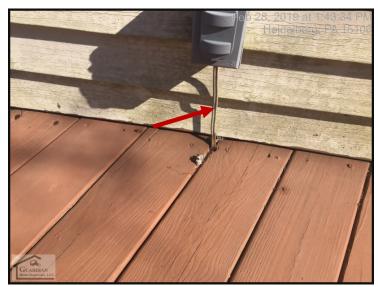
The electrical branch wiring, servicing the exterior electrical outlets, is not rated for outdoor use.
